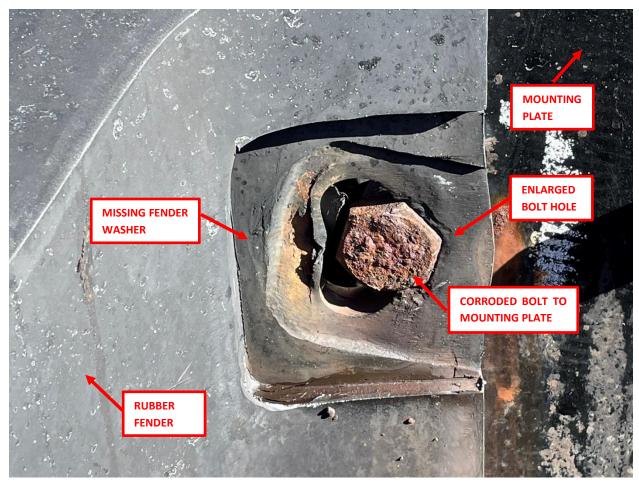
Rubber fender bolt connecting fender to mounting plate.
